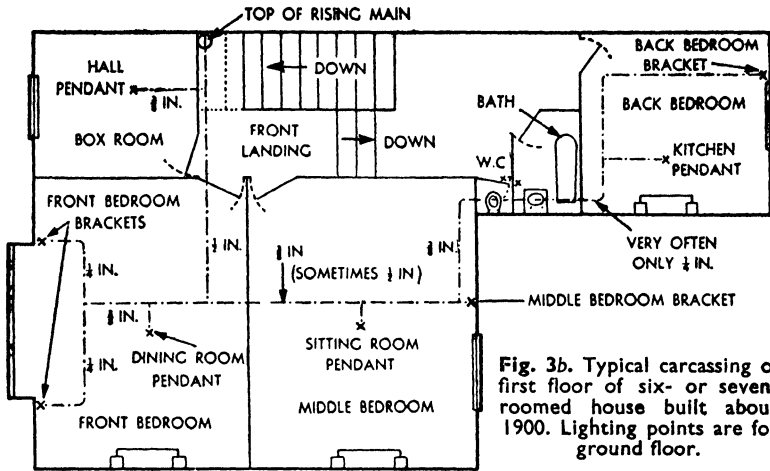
Typical carcassing of first floor of six- or seven-roomed house built about 1900. Lighting points are for ground floor.
